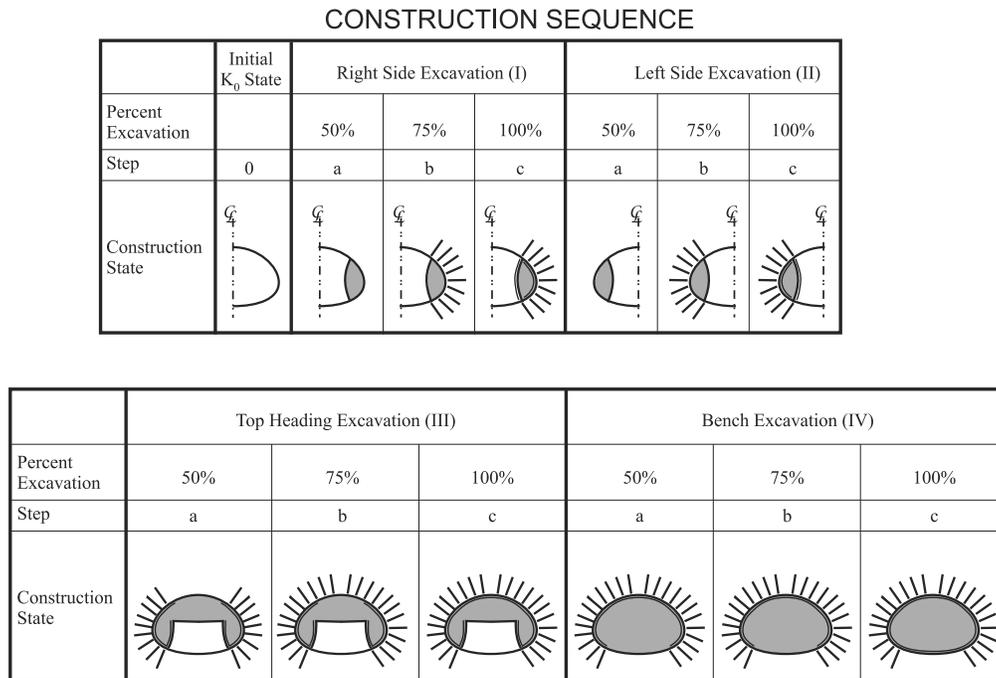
Construction sequence for a multistage tunnel excavation and support
